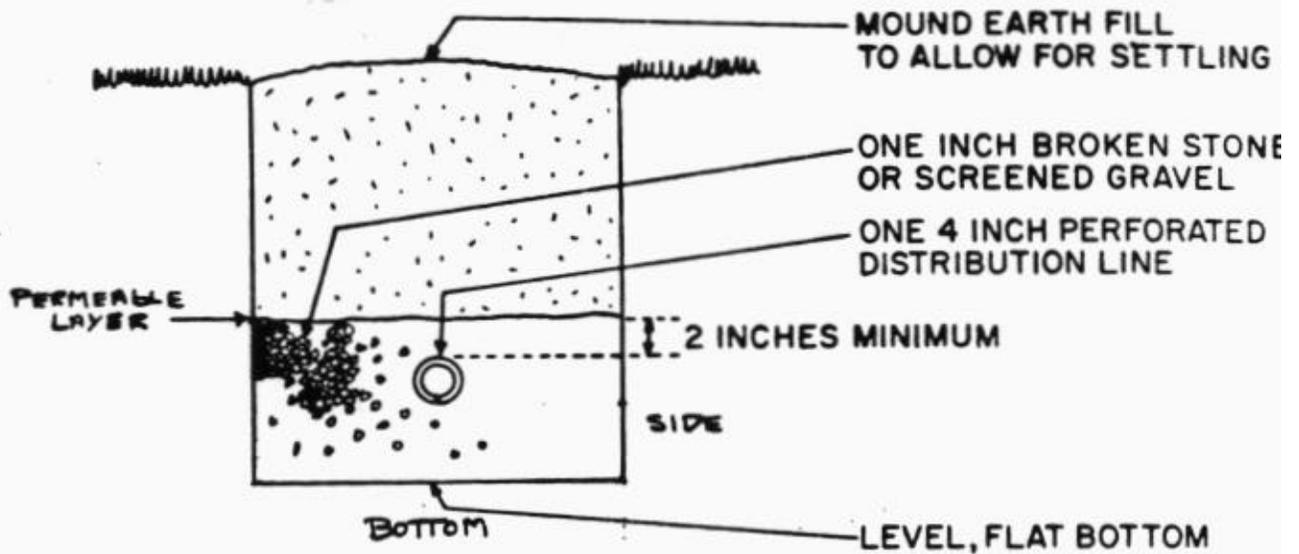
CROSS-SECTION OF DISPOSAL TRENCH
